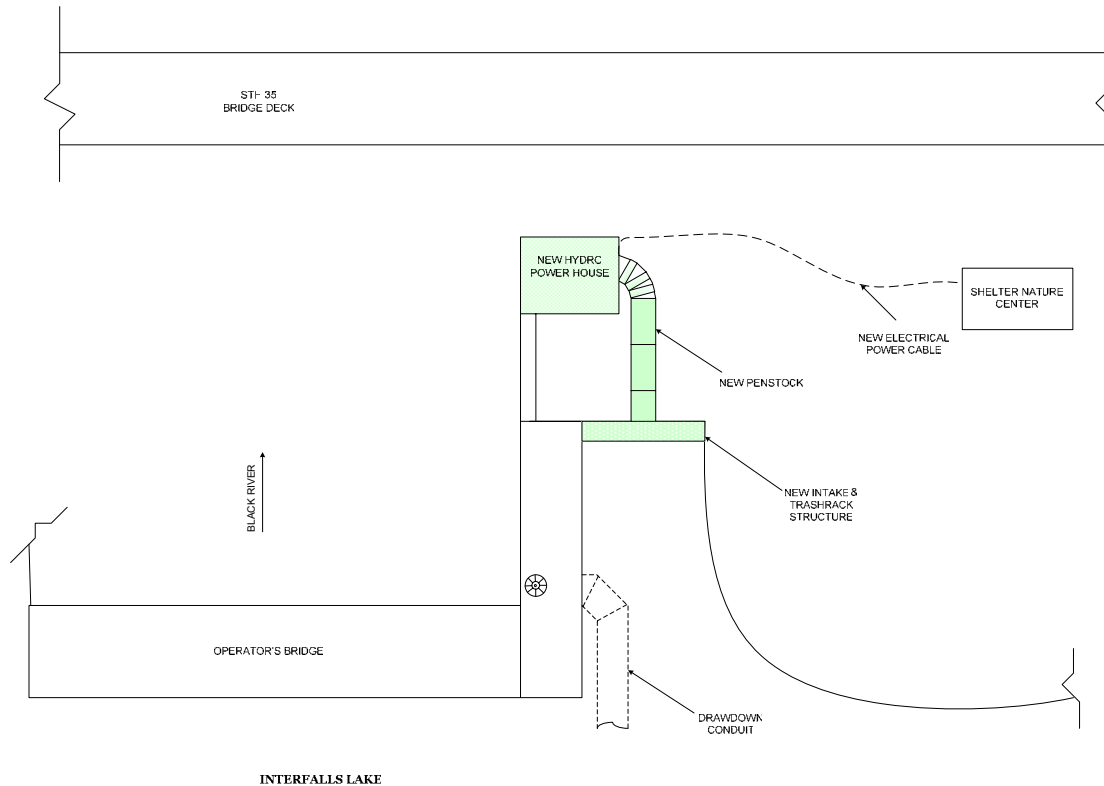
PROPOSED HYDROELECTRIC FACILITY LAYOUT (not to scale)
